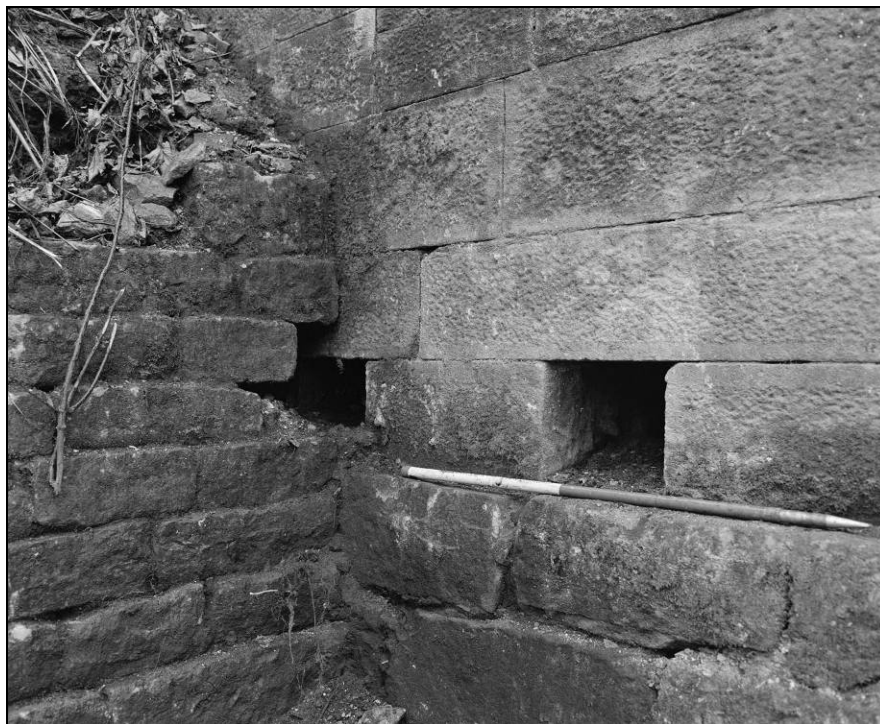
Detail of abutment between building 8 and a retaining wall (film 14:7)
